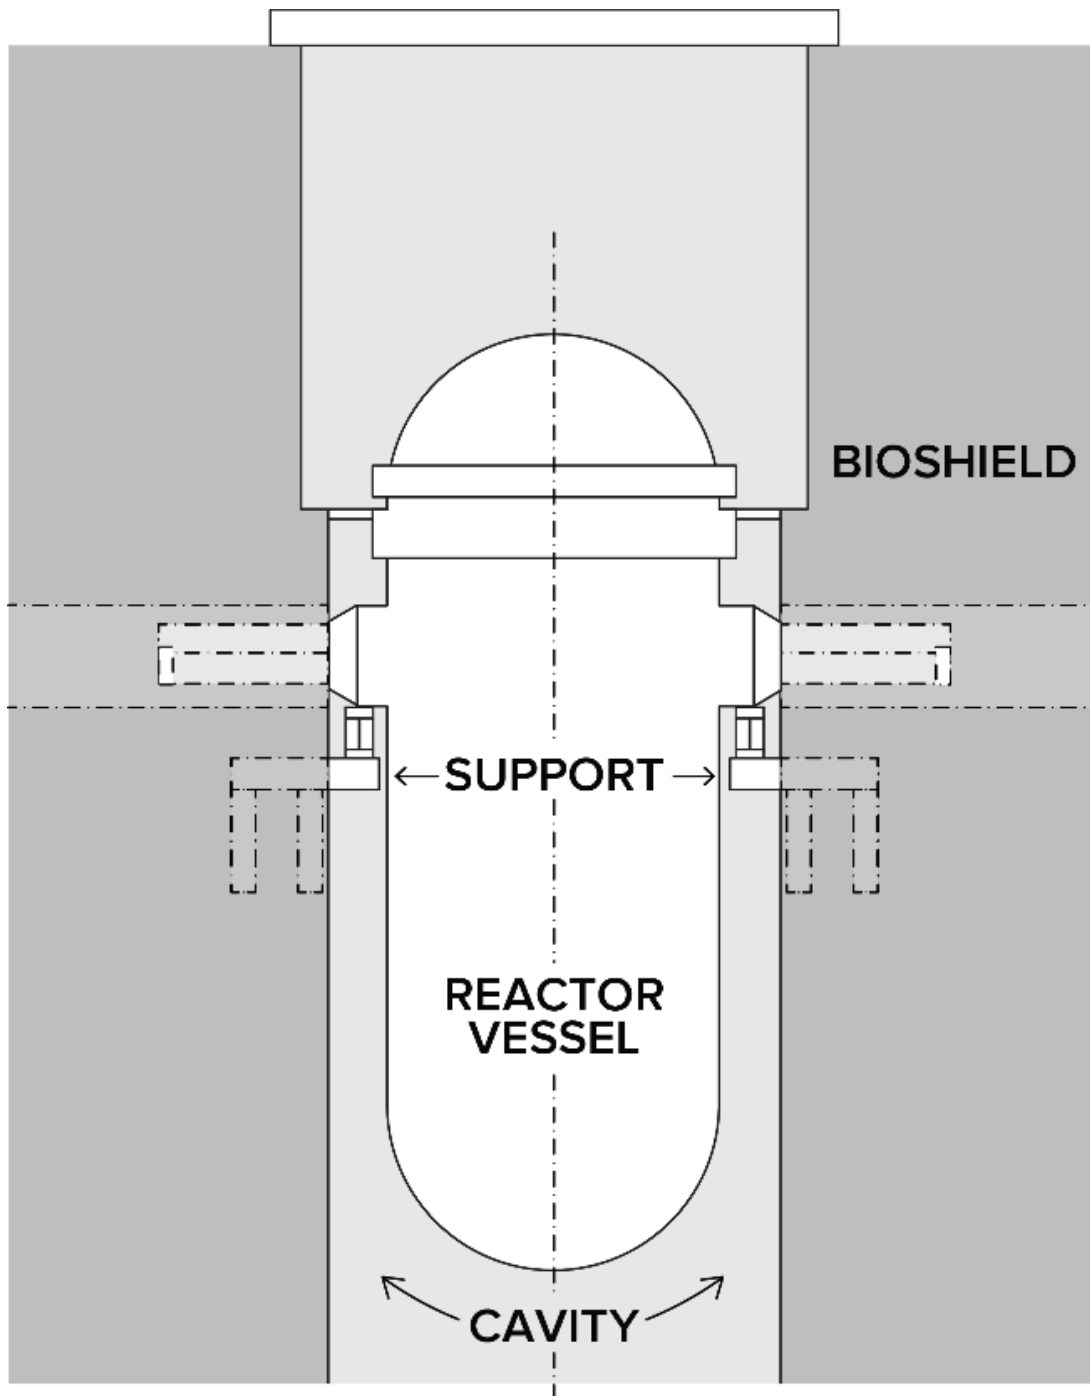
Example of a PWR Supported on Cantilevered Beams or Extended Supports
